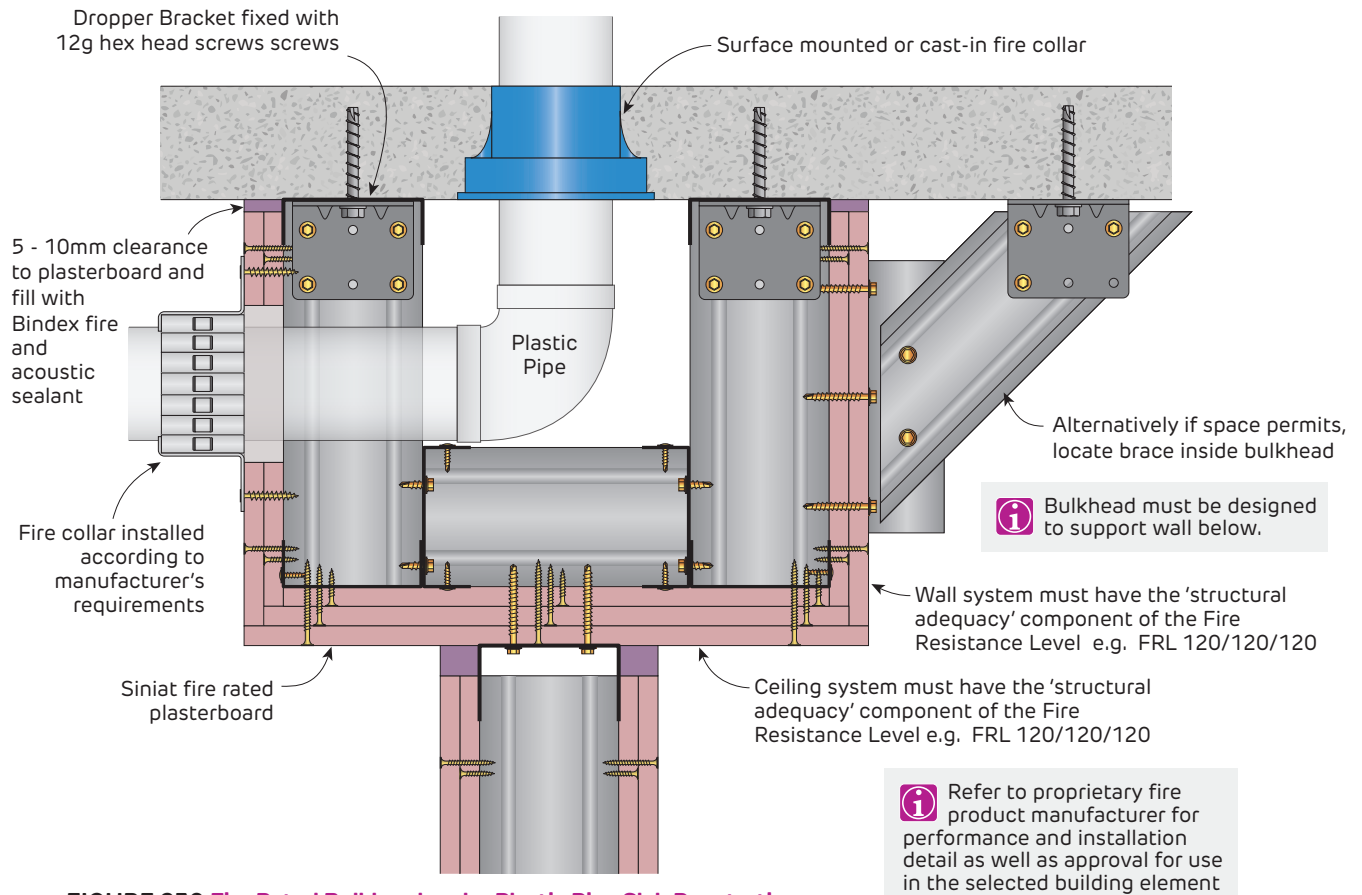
Fire Rated Bulkhead under Plastic Pipe Slab Penetration
